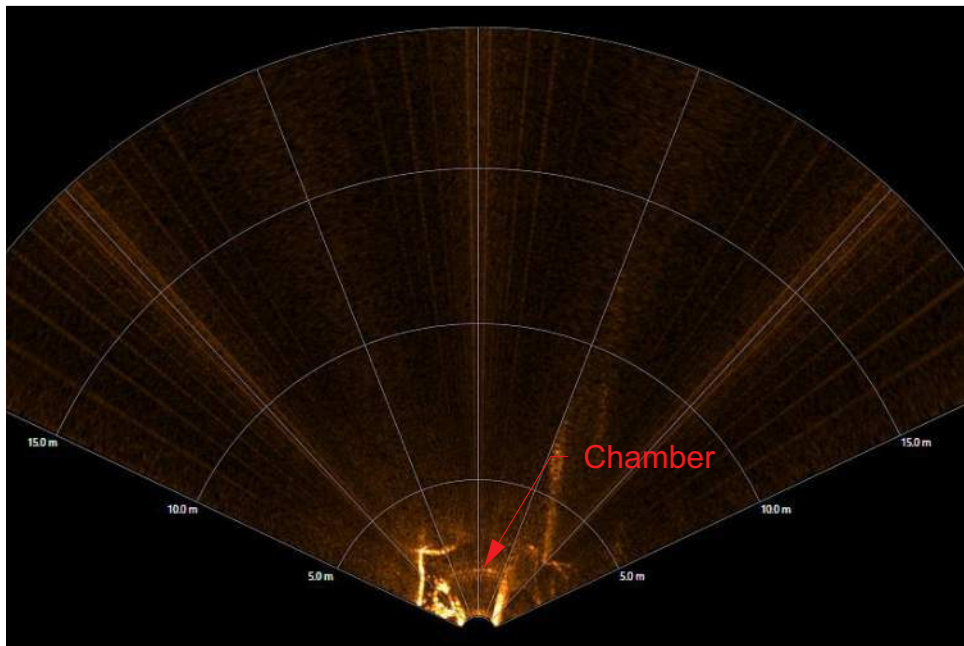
Sonar image 46 feet downstream of Access Point 1. Entering chamber for manhole access
